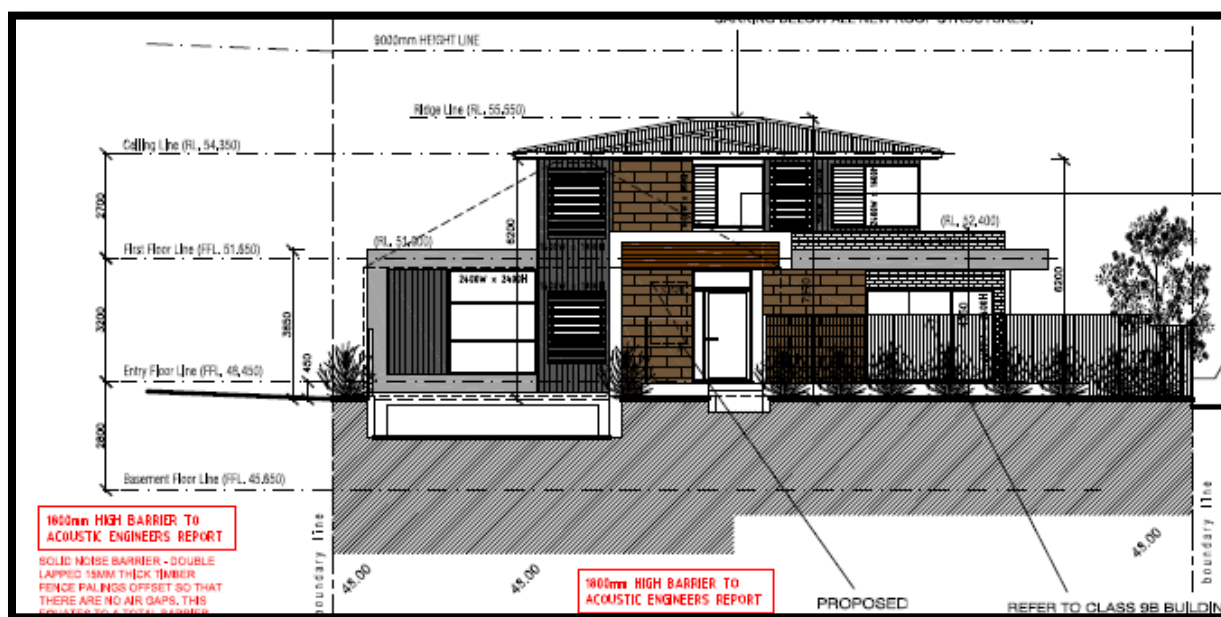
North east (front) Elevation at 49 Jersey Avenue Mortdale (Source – NDGroup Architects)
